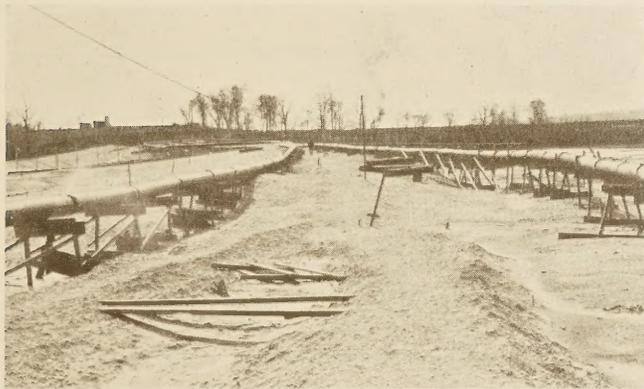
DOUBLE PIPE LINE FOR PLACING SECOND LIFT.
